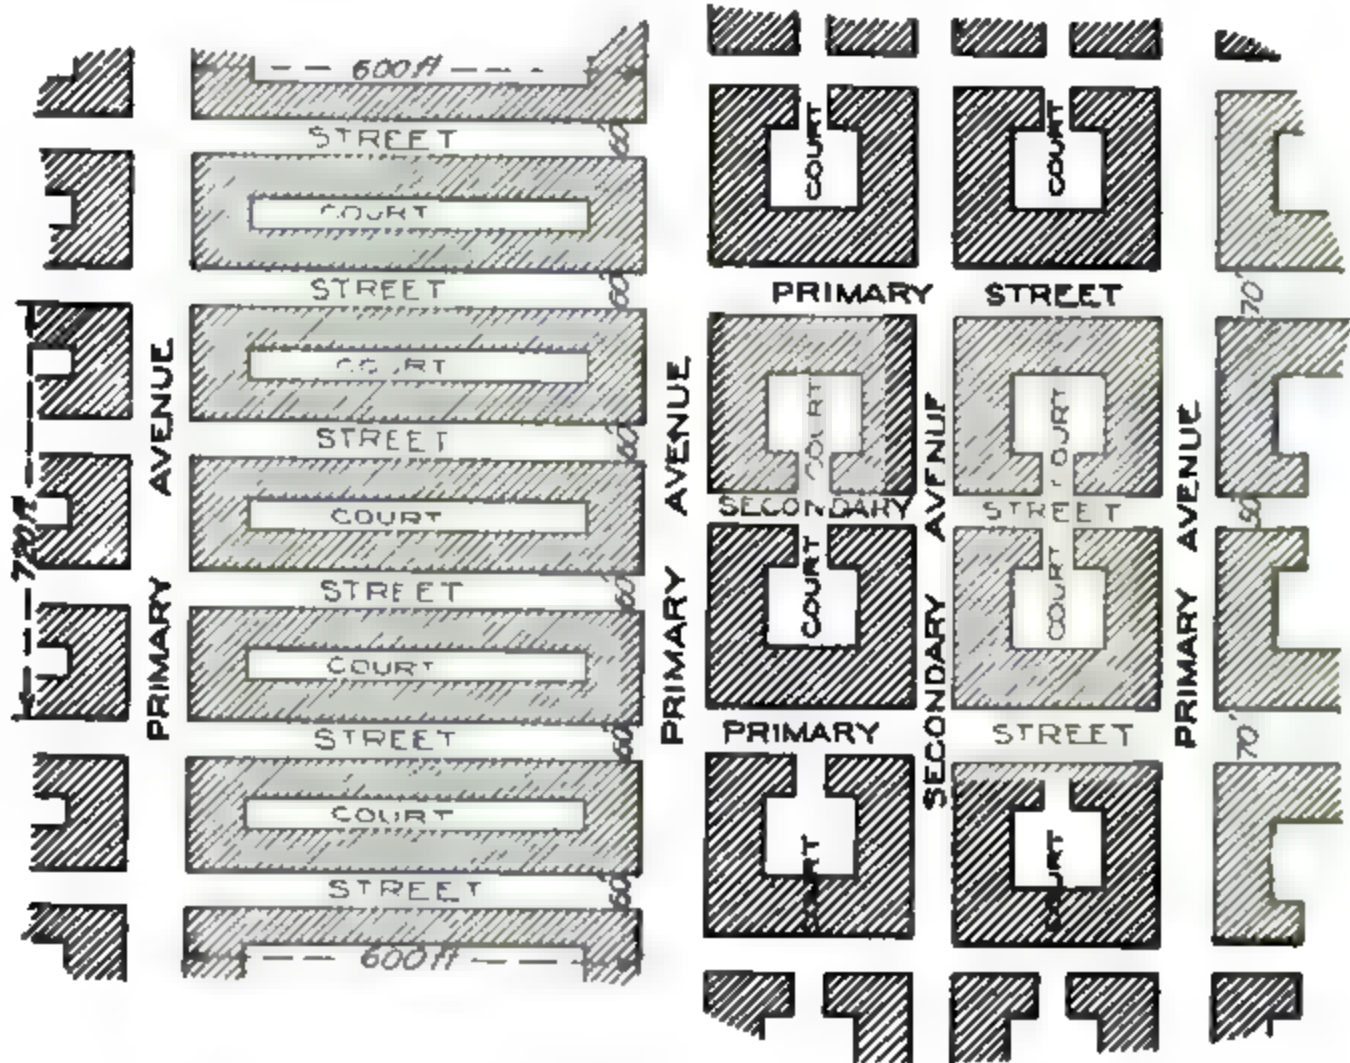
IMPROVED ARRANGEMENT OF STREETS AND BLOCKS.
